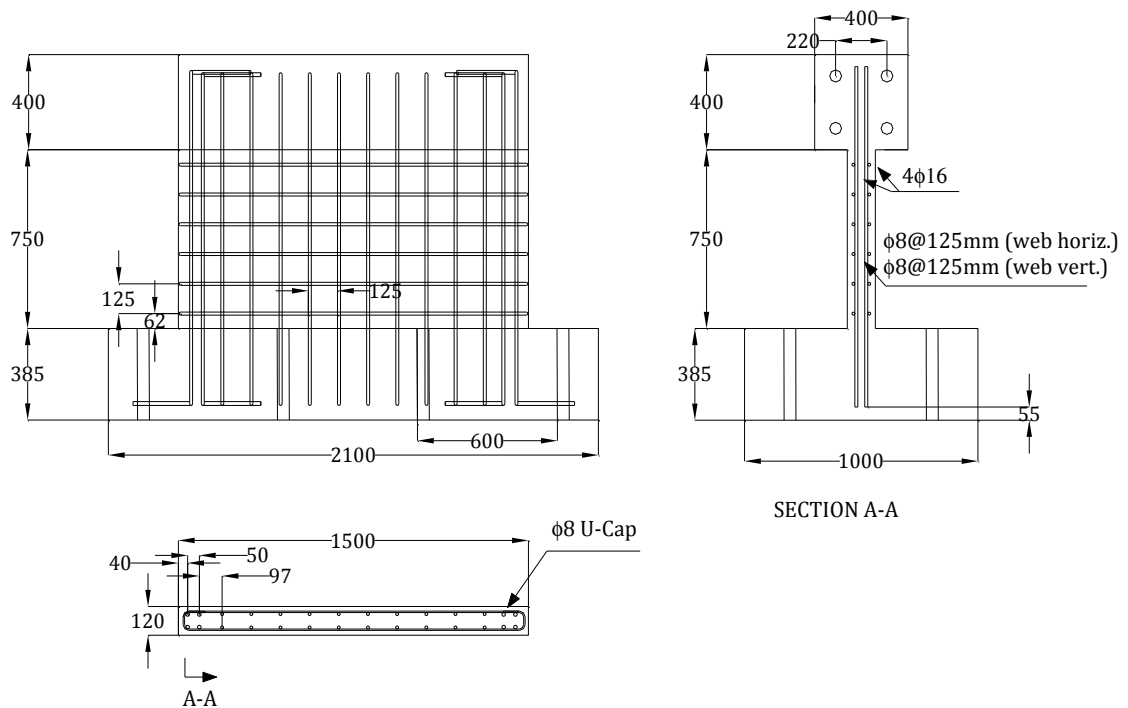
Geometry and wall reinforcement of specimen T2-S1.
